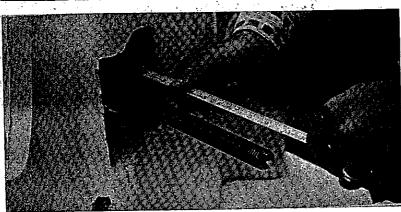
Threaded Stud, Nut, and Bearing Plate.
